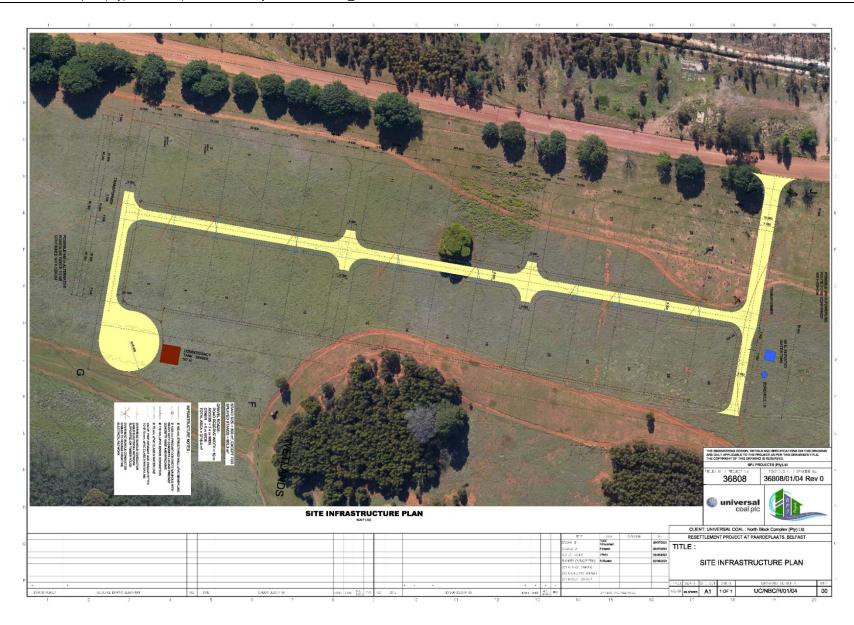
Proposed North Block Complex (Pty) Ltd Paardeplaats Community Residential Area Layout
